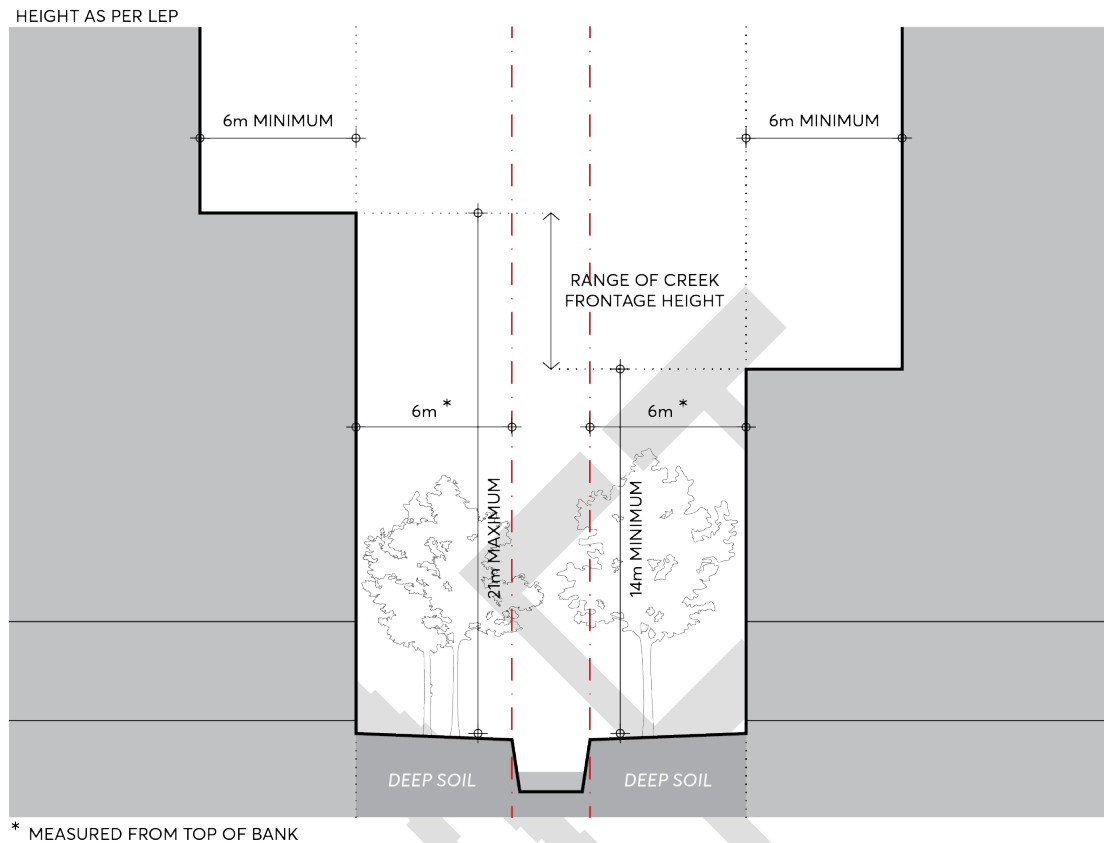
Creek Corridor Setbacks and Street Wall Height
